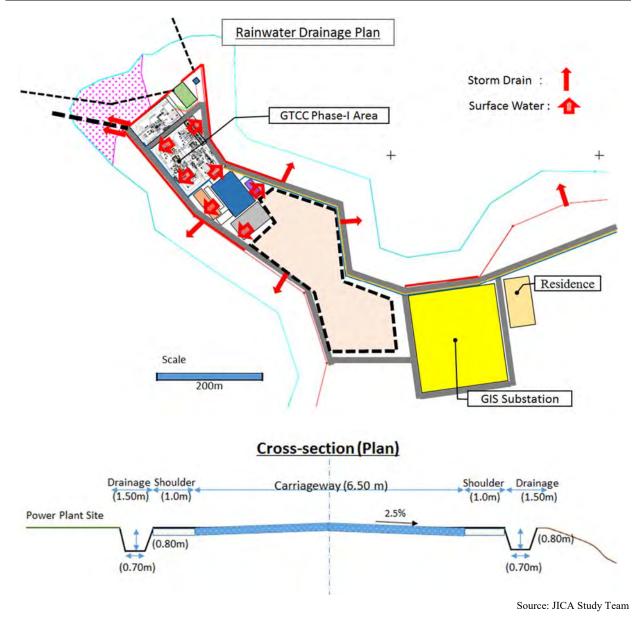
Draft Plan of Rainwater Drainage System and Cross-section
